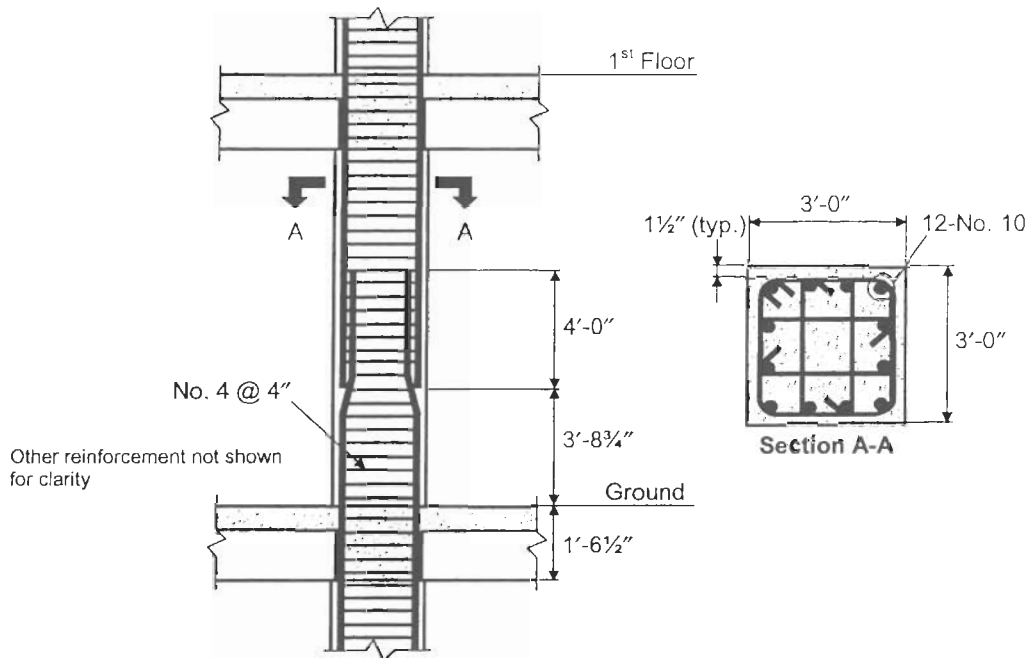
Reinforcement Details for Column C3 Supporting the 1<sup>st</sup> Floor Level (SDC D)
